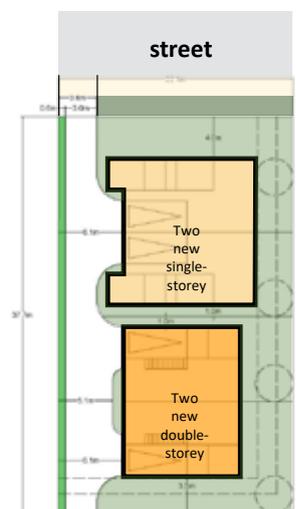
Two single-storey, two-bedroom dwellings, and two double-storey, three-bedroom dwellings.
